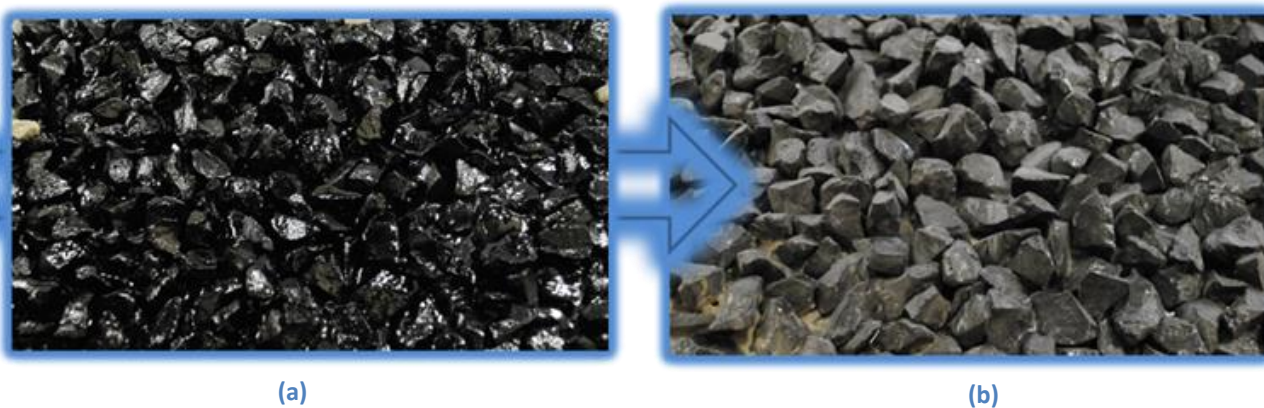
(a) Newly constructed seal (b) dulled seal surface using fines
